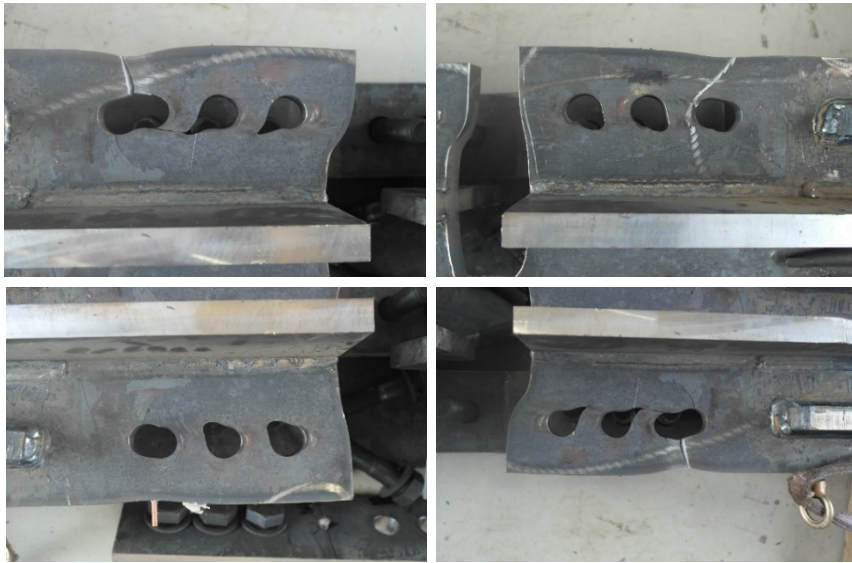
Block Shear Failure of Specimen 25T-490-3-60
